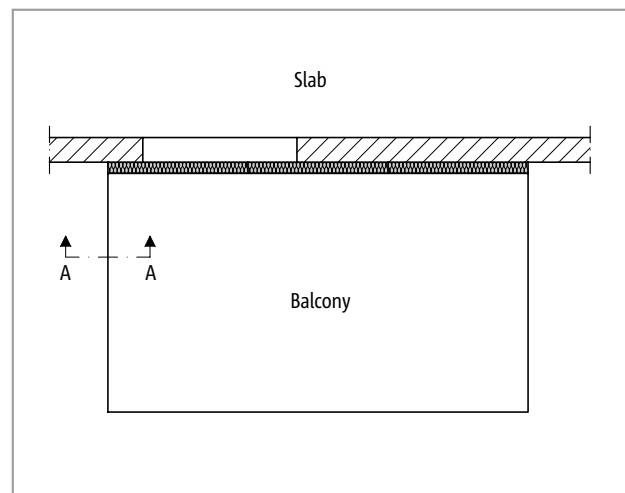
Schöck Isokorb® T type K: Diagram of the position of Section A-A
